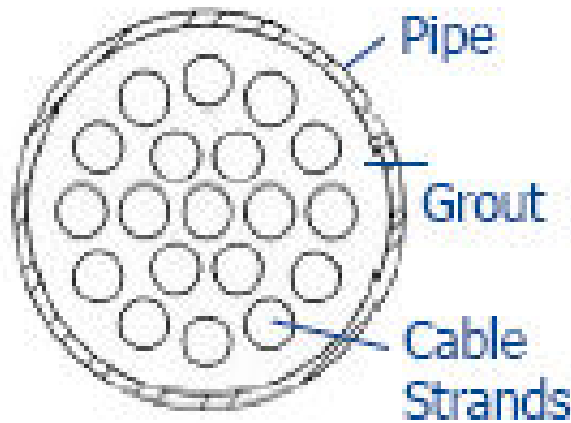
Cross section of the multiple strands stay-cable [79]
